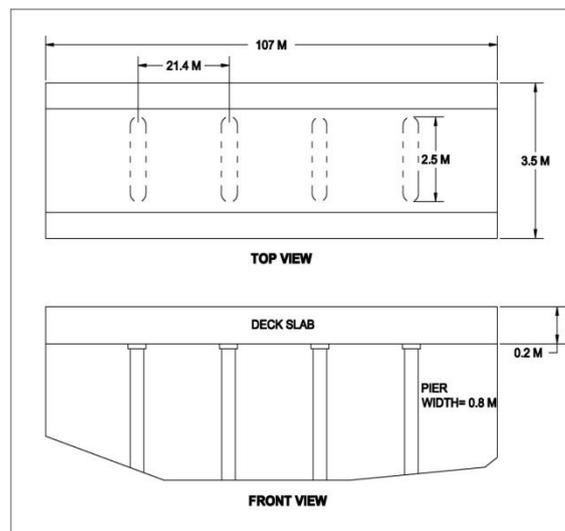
Cad drawing of Kukadi River Bridge at Ozar
